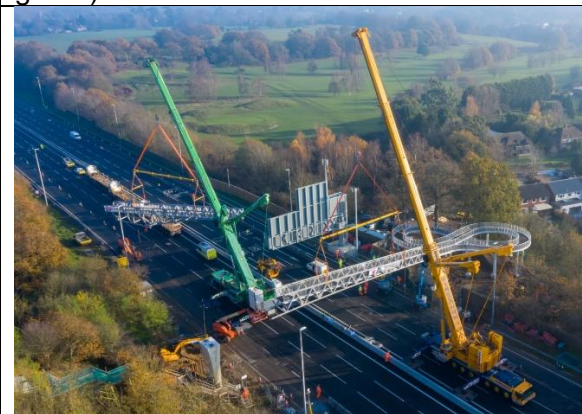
M20 East Street Footbridge Installation – Crane Arrangement
